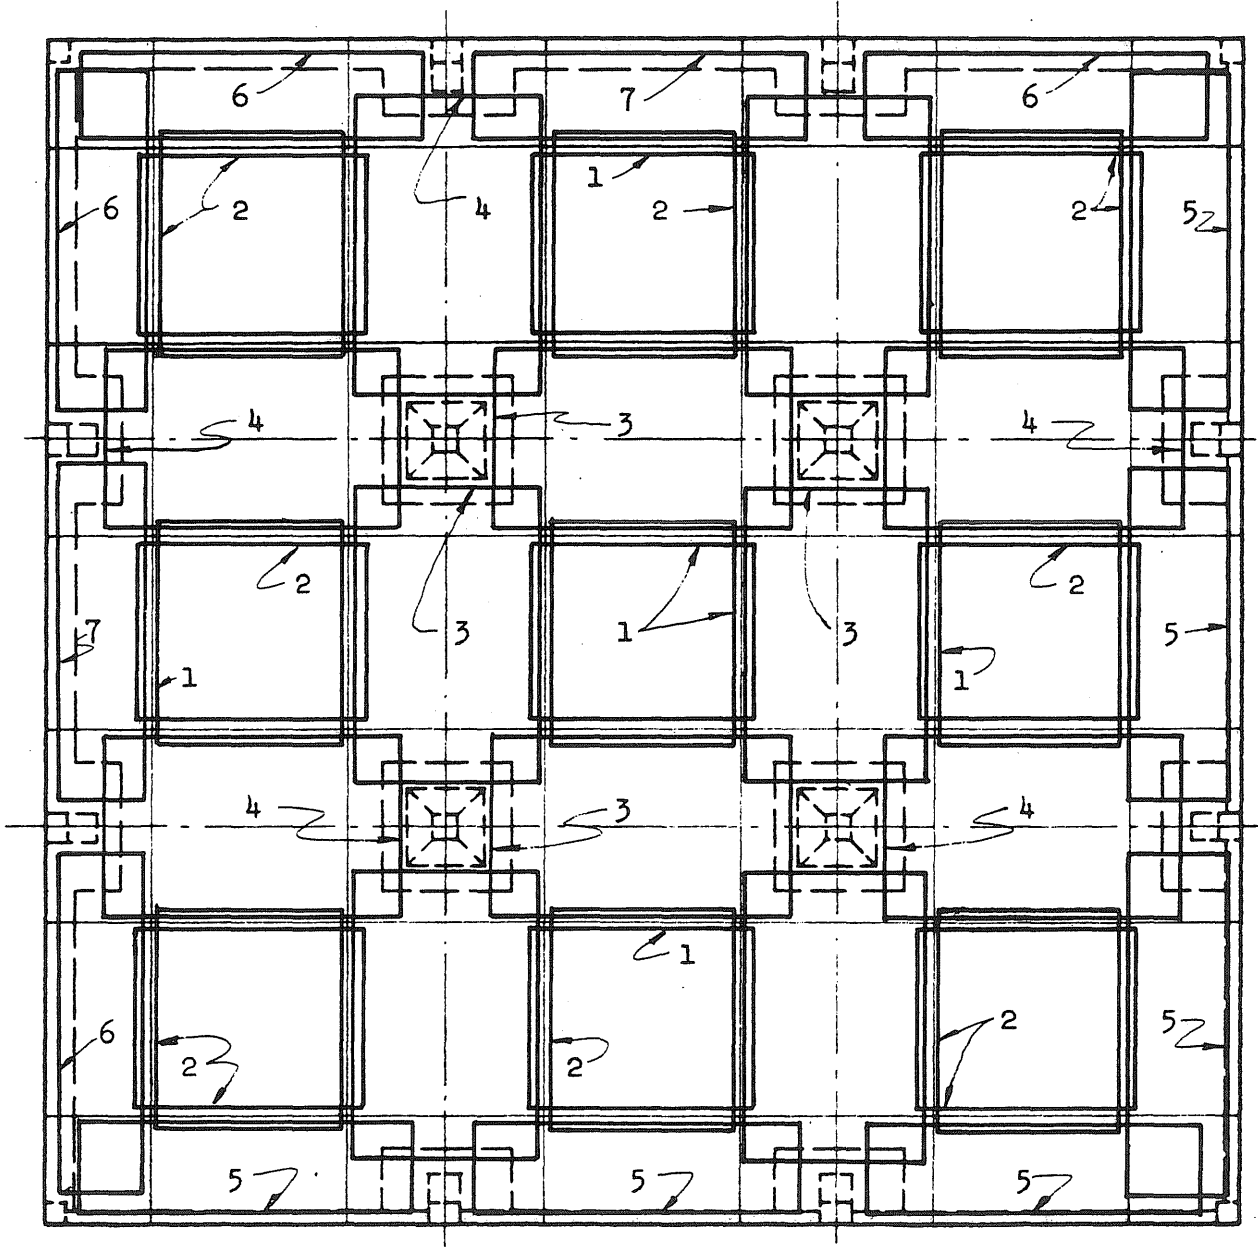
(b) ARRANGEMENT OF WELDED WIRE FABRIC
